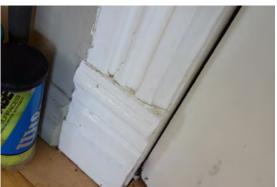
24 Ann Street - INTERIOR – 2nd FLOOR – living room – wood door trim
